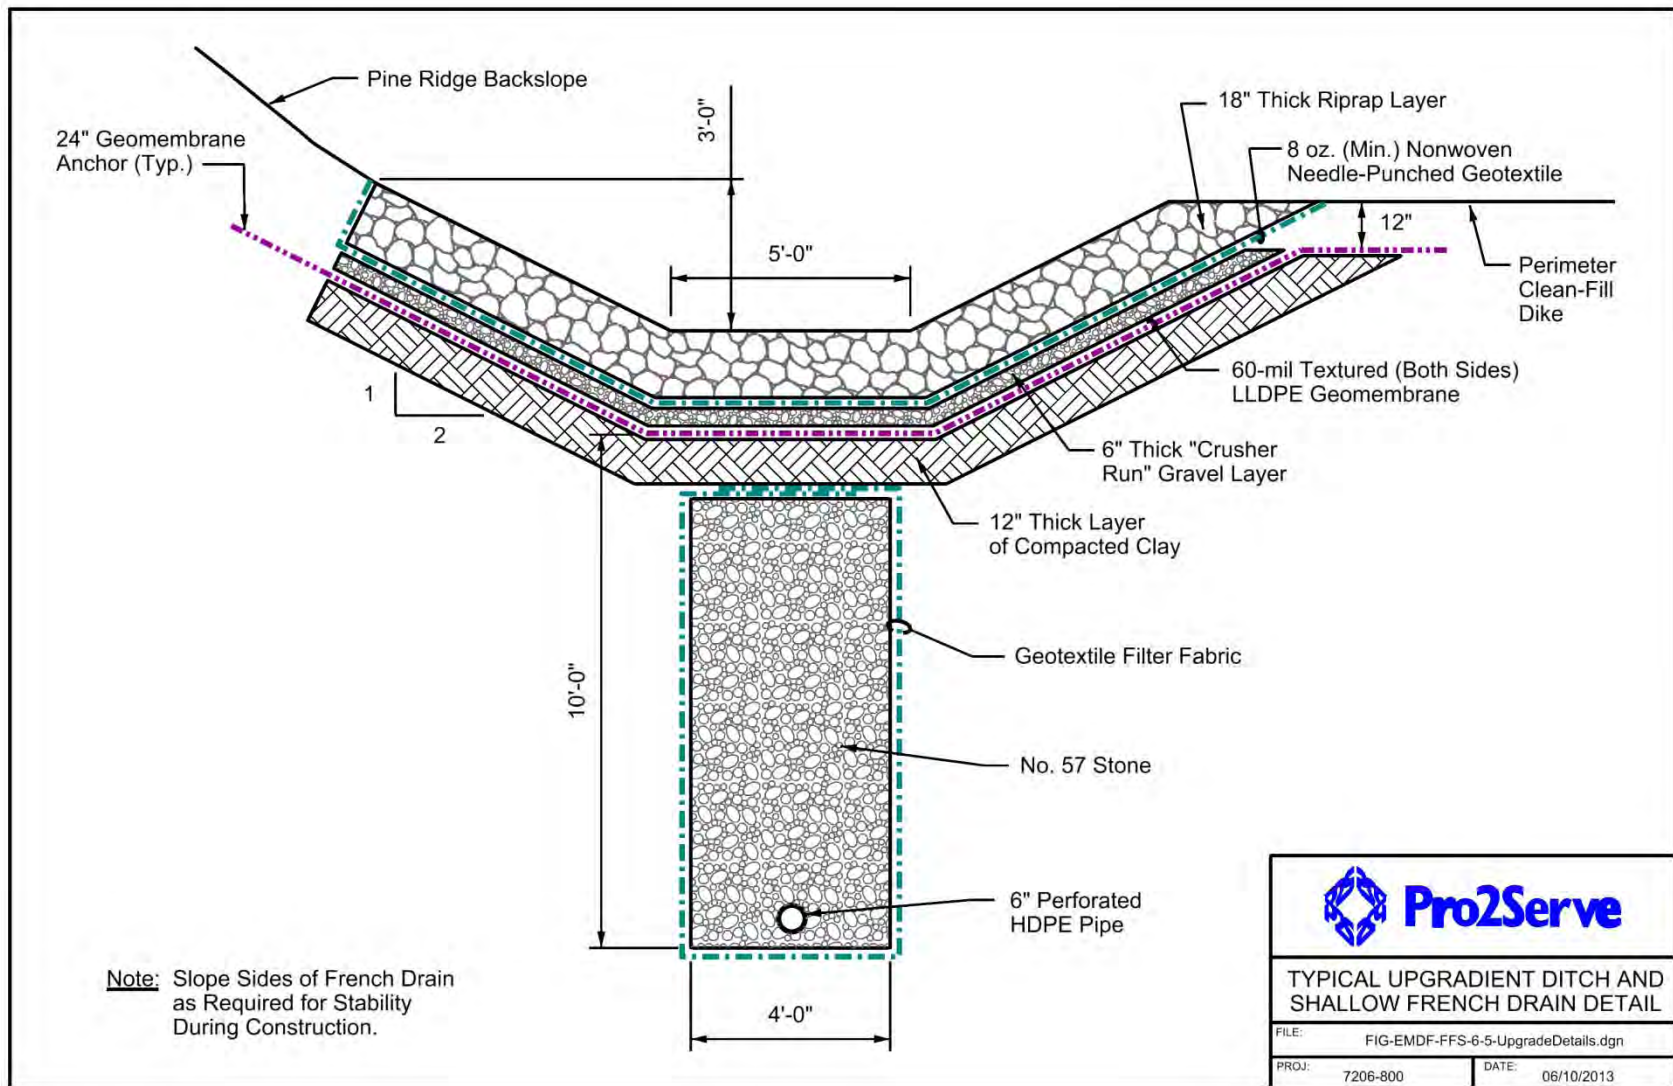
Typical Upgradient Ditch and Shallow French Drain Detail
